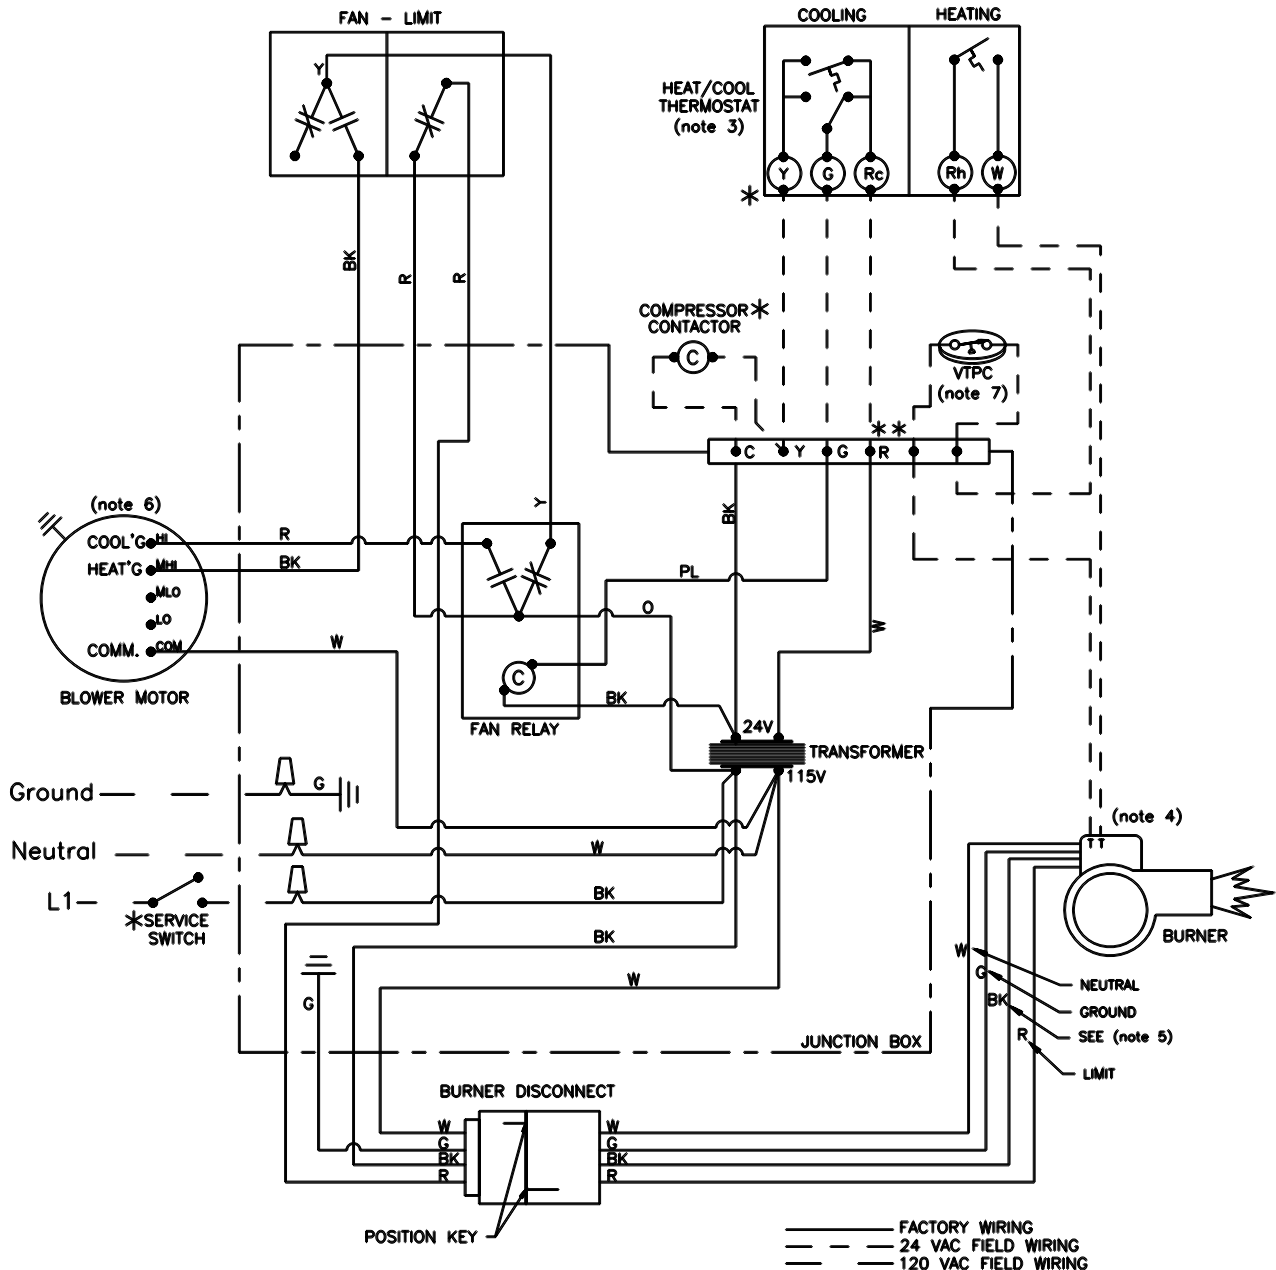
Wiring – SCH & SCL furnaces with direct-drive blower
